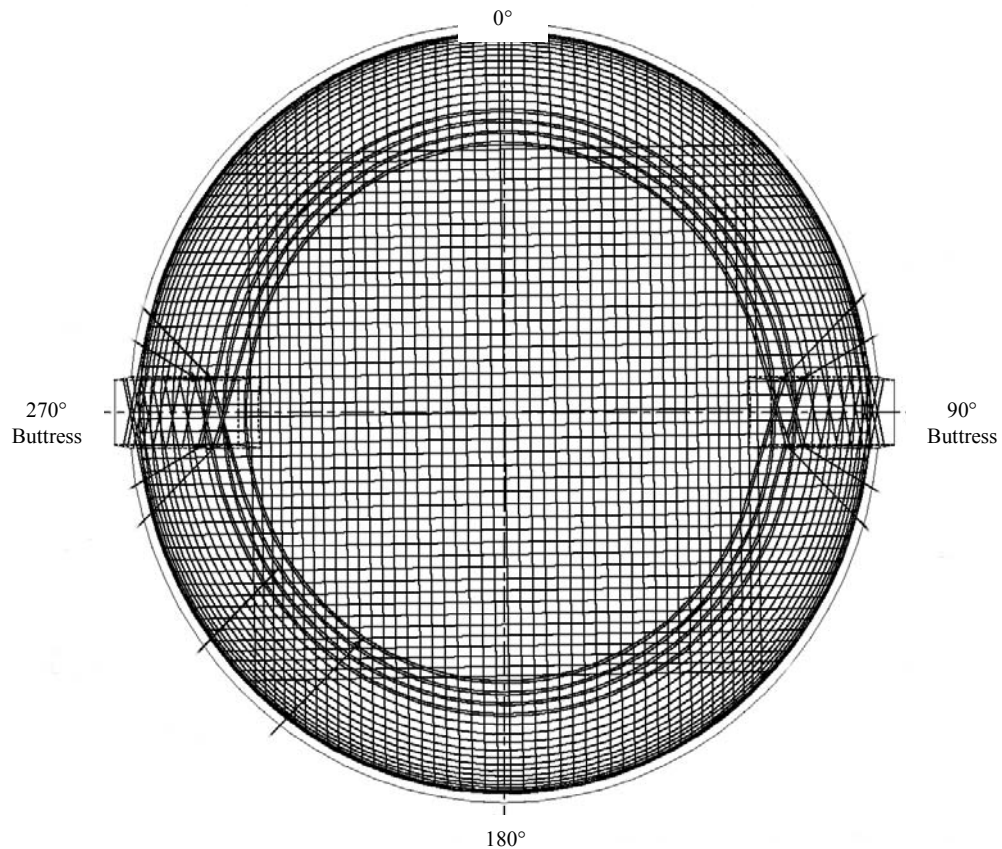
Pre-stressing tendon arrangement, dome (plan view from above).
